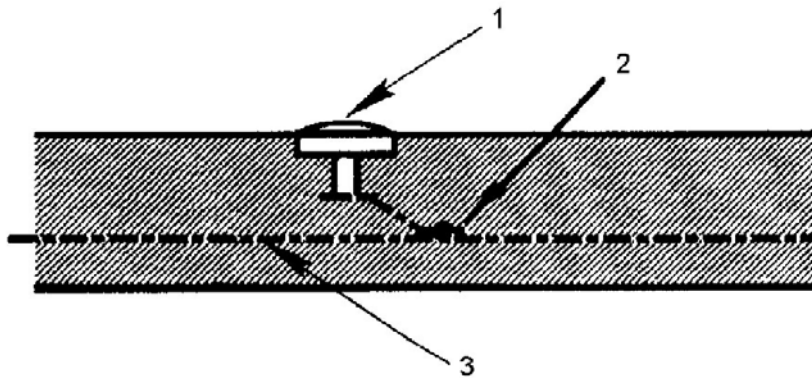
Construction of an external LPS on a structure of steel-reinforced concrete using the reinforcement of the structure outer walls as natural components
